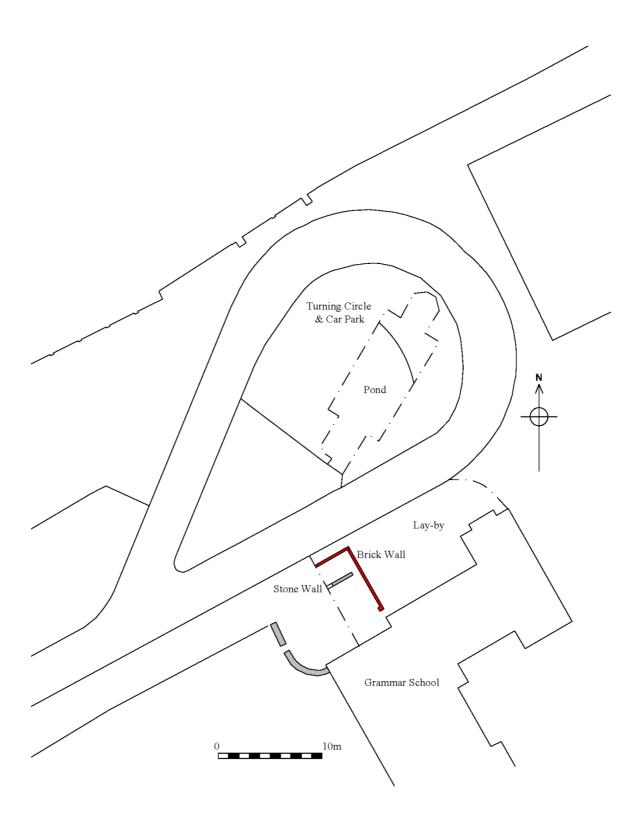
Site plan showing locations of areas watched *Plan adapted from architects plan provided by client.
